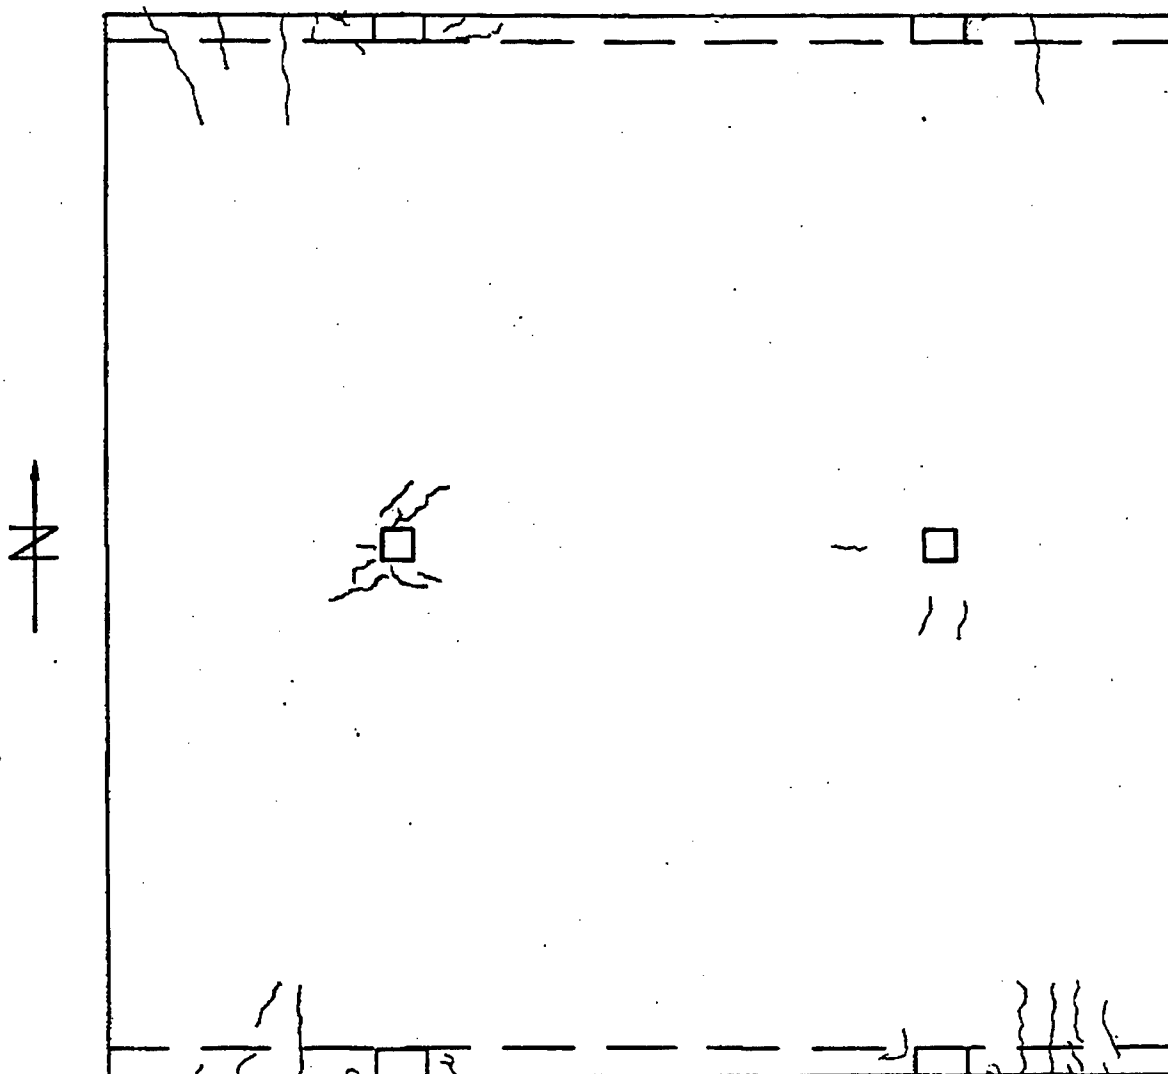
Crack Pattern, First Floor Slab, Top Side, Pre-Test
